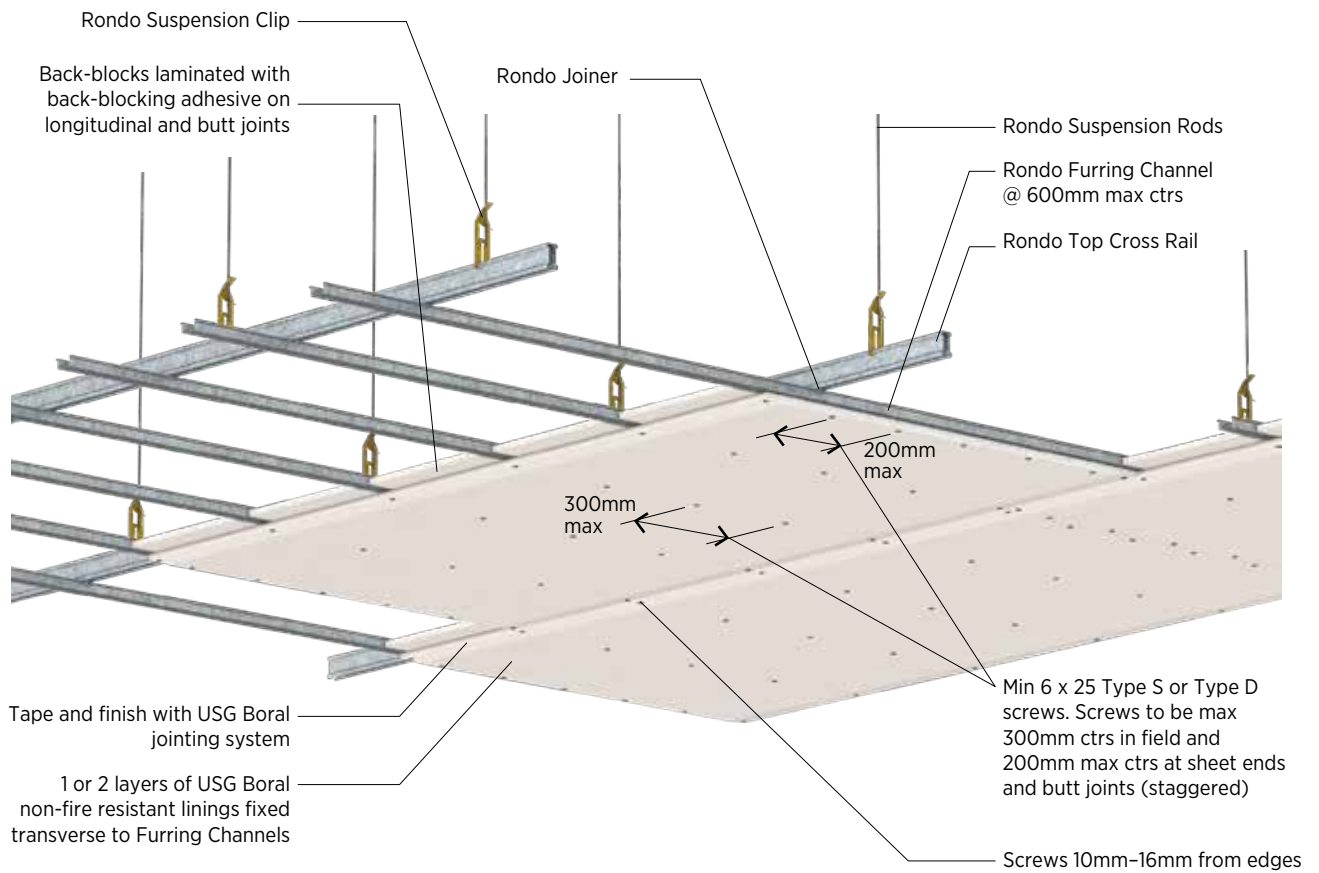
Non-Fire Rated Ceiling – Screw Fixing Layout
